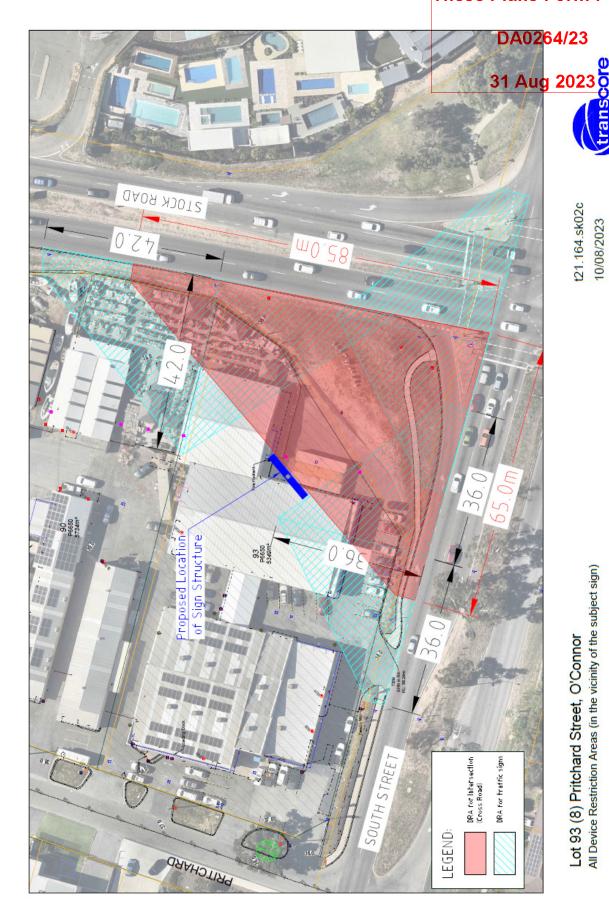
DRA assessment for the relevant intersection of South Street and Stock Road (Melville Mandurah Hwy) and traffic signs
